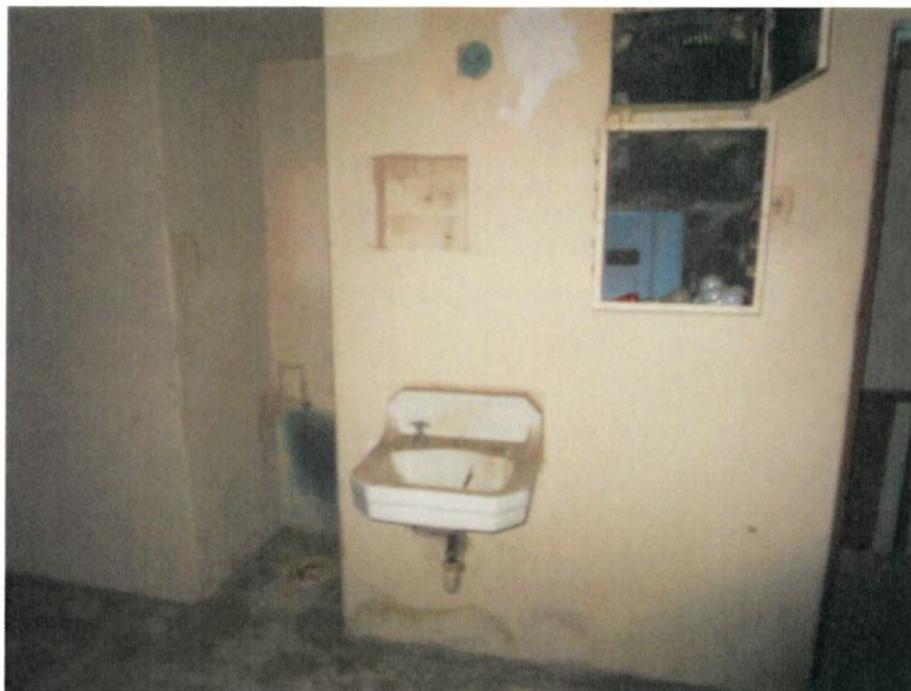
Ritz Theater sink at projection room storage/vault room with adjacent drain.
